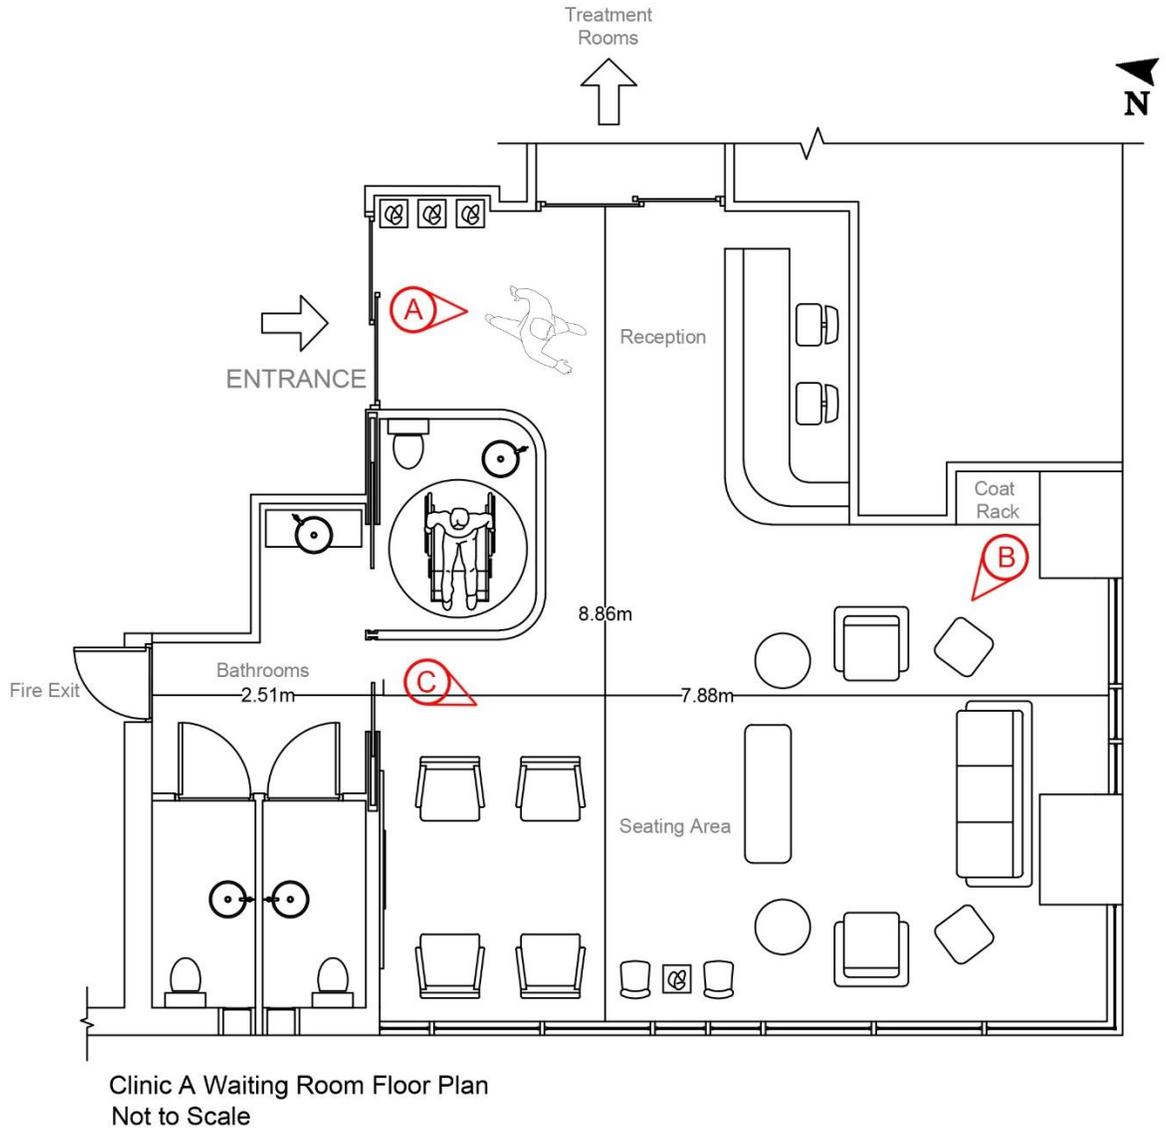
Floor plan of Clinic A (drawn by the author, 2022).
